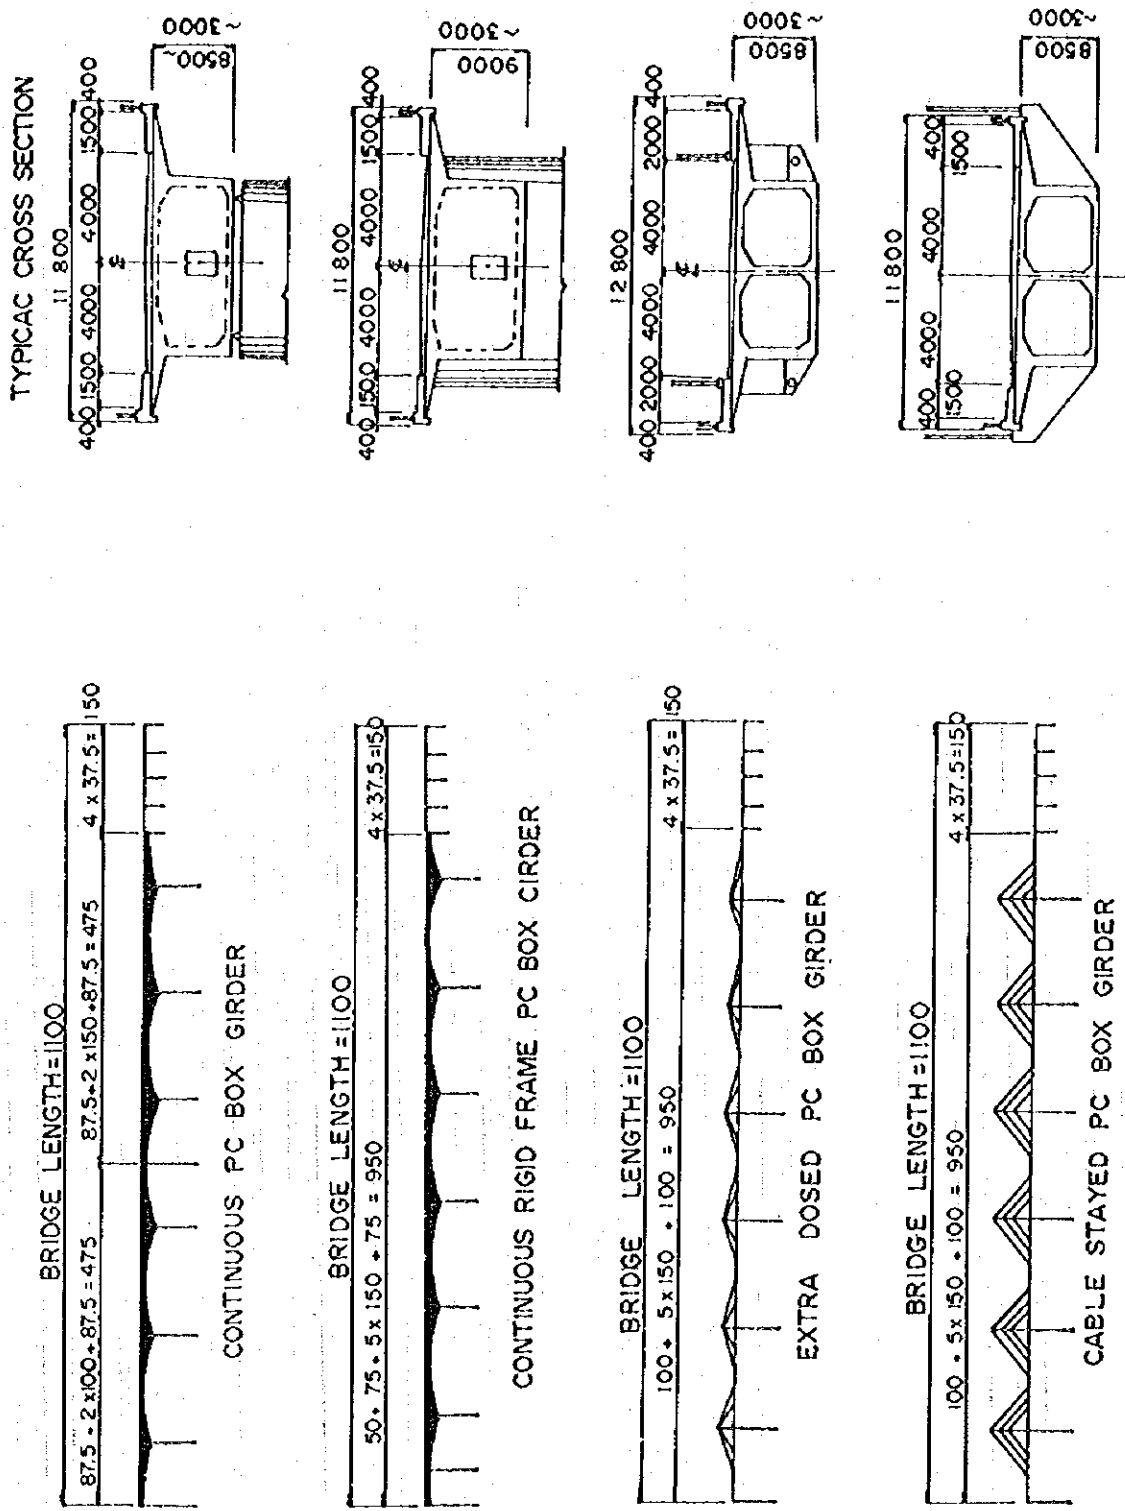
SPAN COMPOSITION BY CONCRETE BRIDGE TYPE (ROUTE-C)
